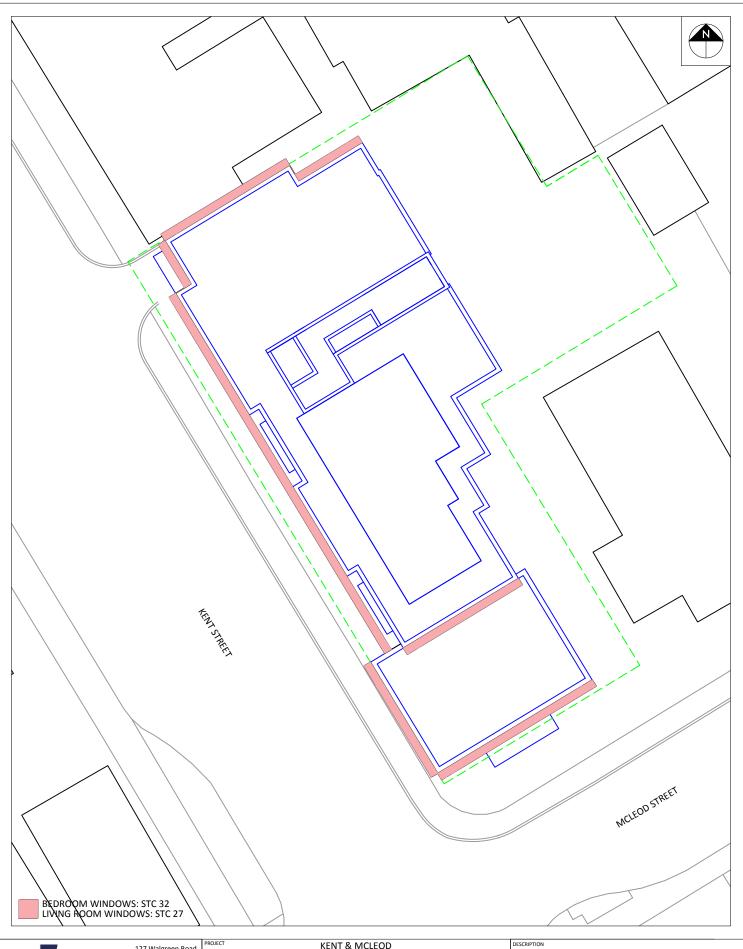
SITE PLAN AND SURROUNDING CONTEXT
